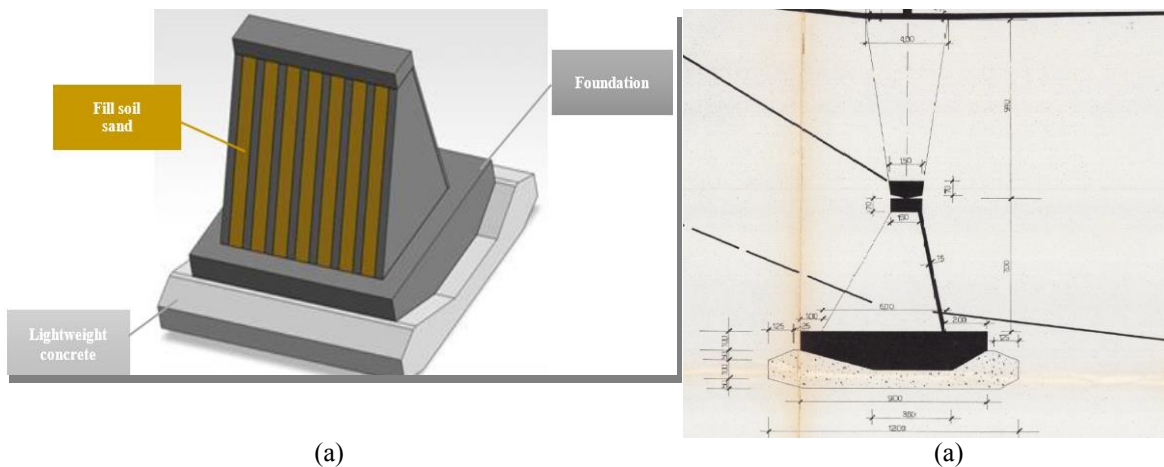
3D detail (a) and the original scheme (b) of the foundation – abutment.
